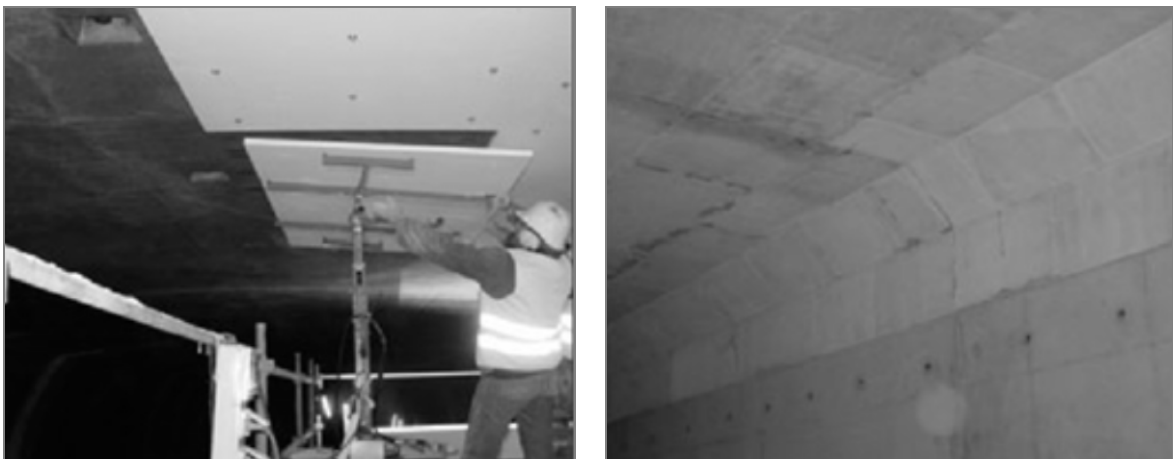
Installation of pre-fabricated thermal barrier boards in tunnel lining [37]
